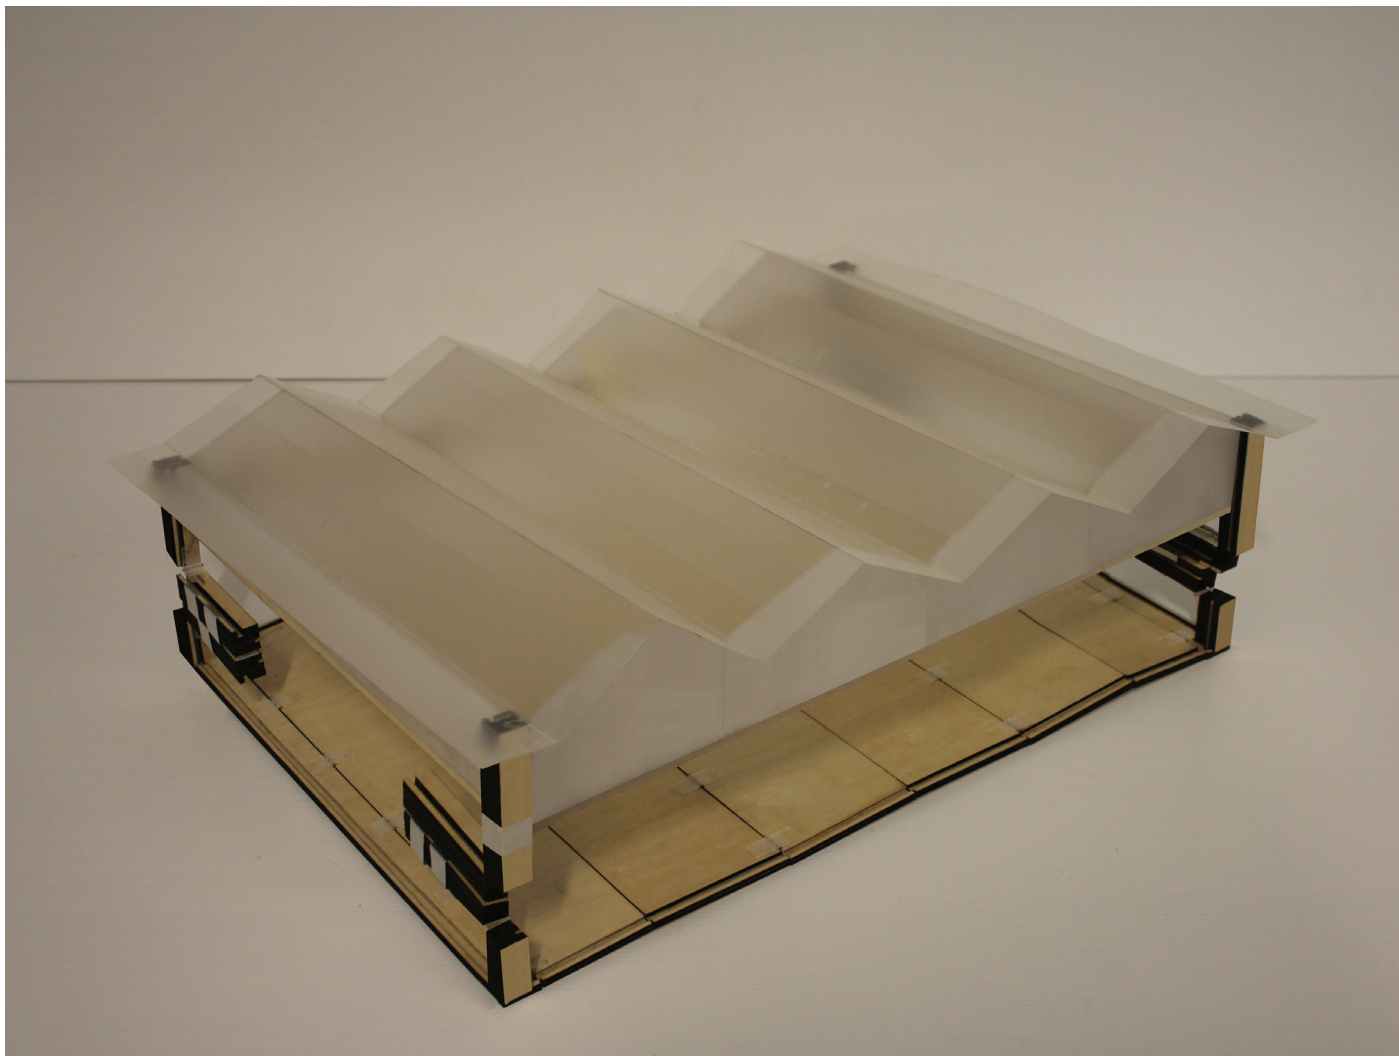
1:10 scale model - concertina floor and beams are secured and upper panels attached
